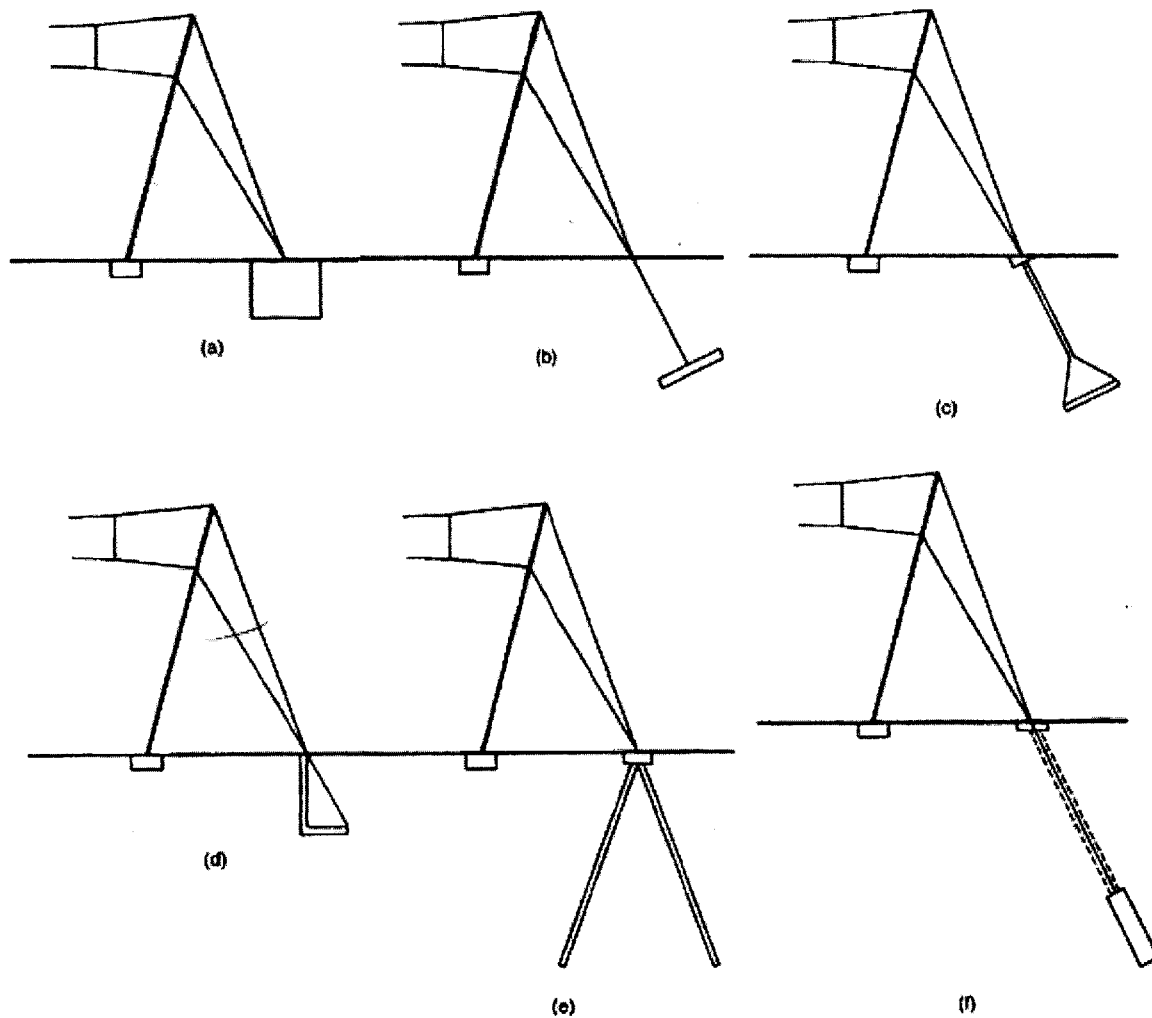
(a) Gravity anchor, (b) Plate anchor, (c) Mushroom anchor, (d) Retaining wall anchor, (e) Tension piles and (f) Ground anchor.
